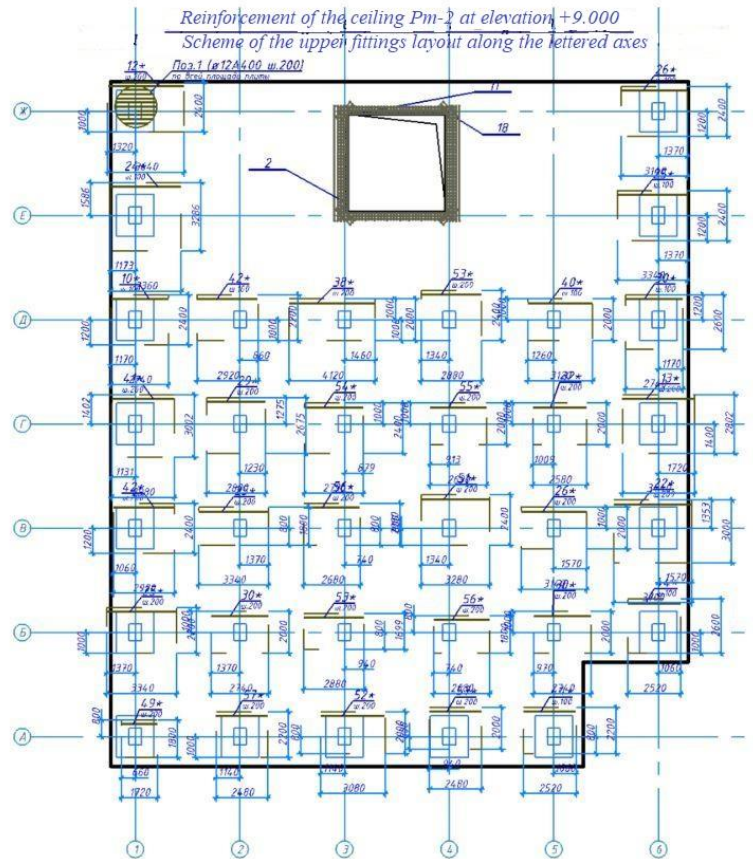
slab reinforcement PM-2 at elevation +9.000. Layout diagram of top reinforcement along alphabetical axes
